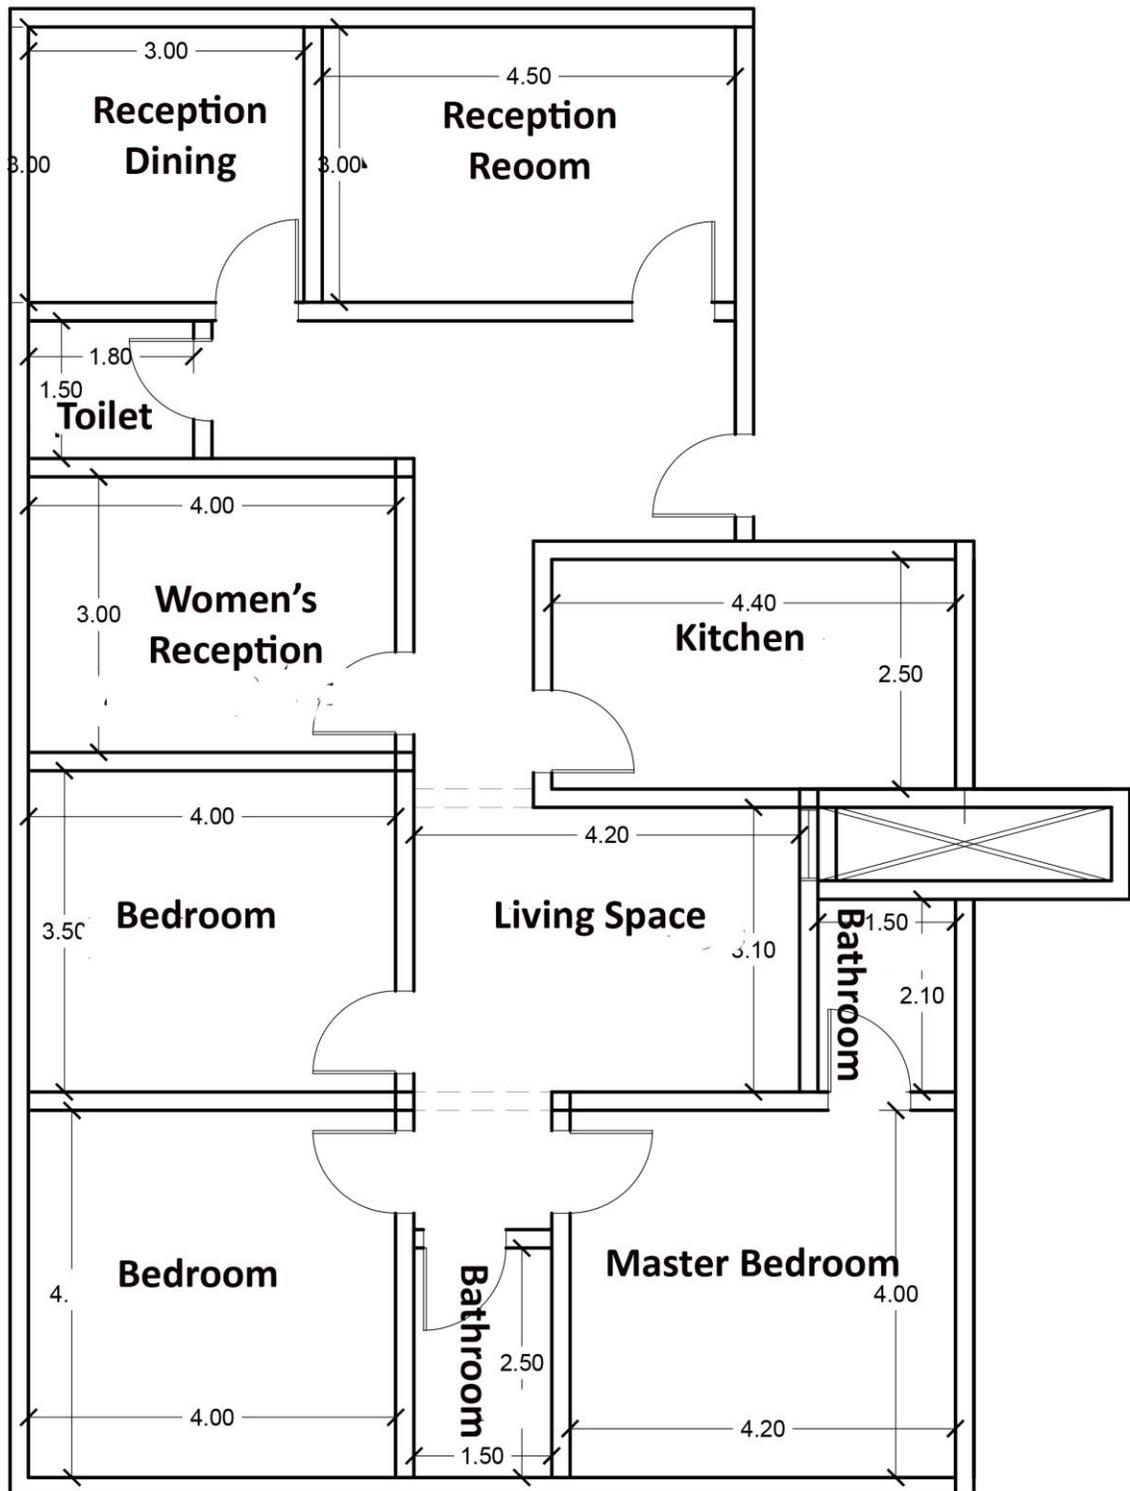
Sample 2 of common flat floor plan in Jeddah
